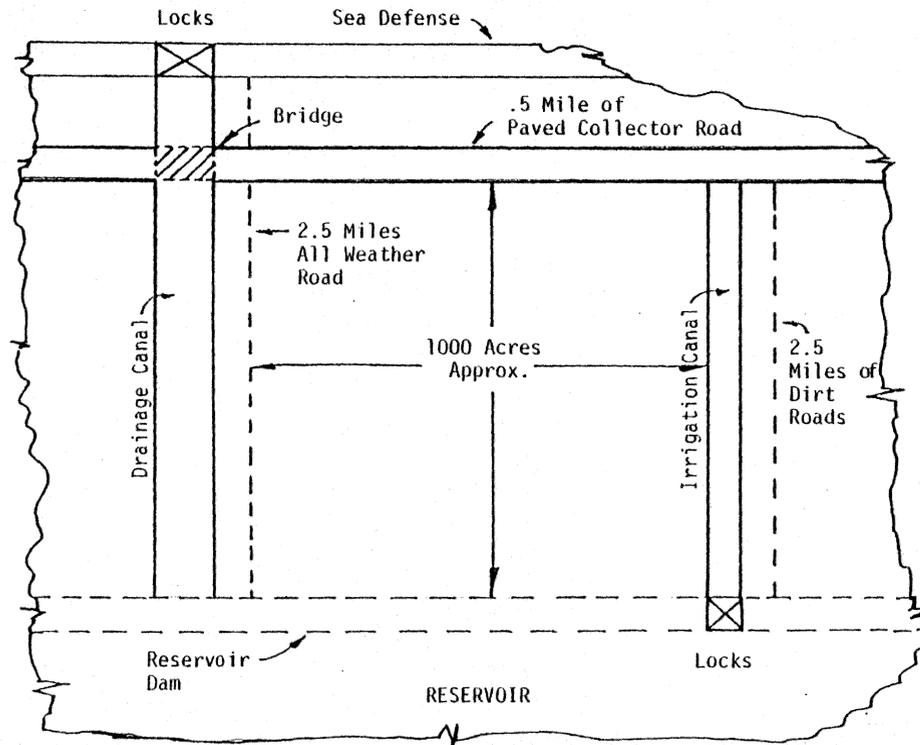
Typical Layout Rice Farm Roads and Drainage and Irrigation Infrastructure [25].
